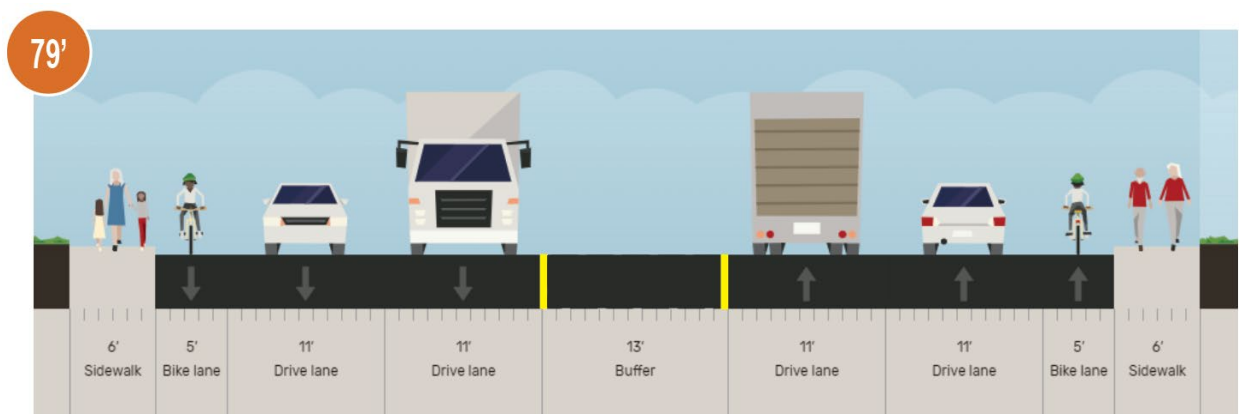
TYPICAL CROSS-SECTION OF THE EAST END
